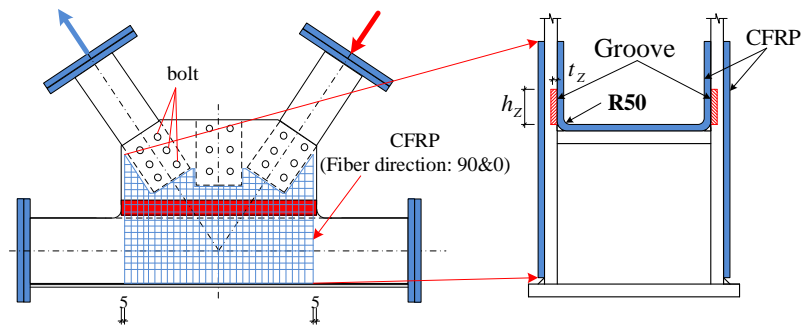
Design method for corroded gusset plate connection.
